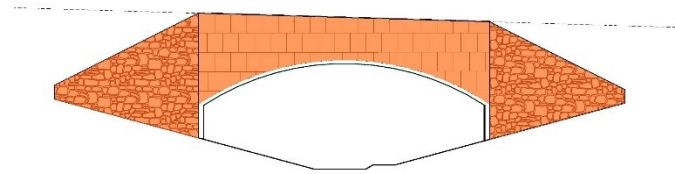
Elevation View of Proposed Long Span Arch Structure
